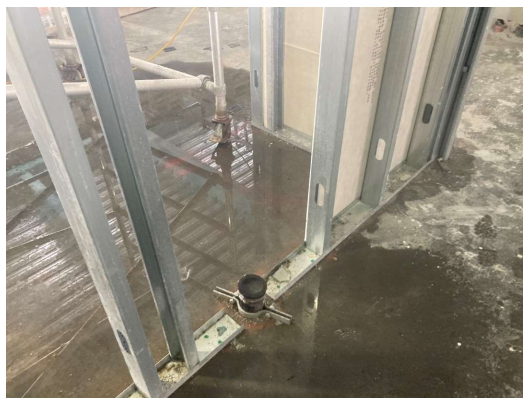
Water starting to spread to an area where drywall had just been installed—this also had to be replaced.
